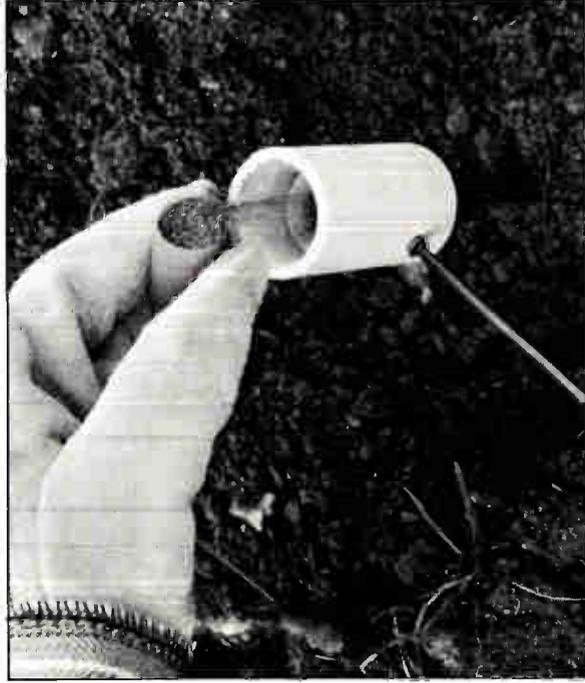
Pour the weld metal into the mold. Note that a separate starting material will remain in the bottom of the weld metal container.
